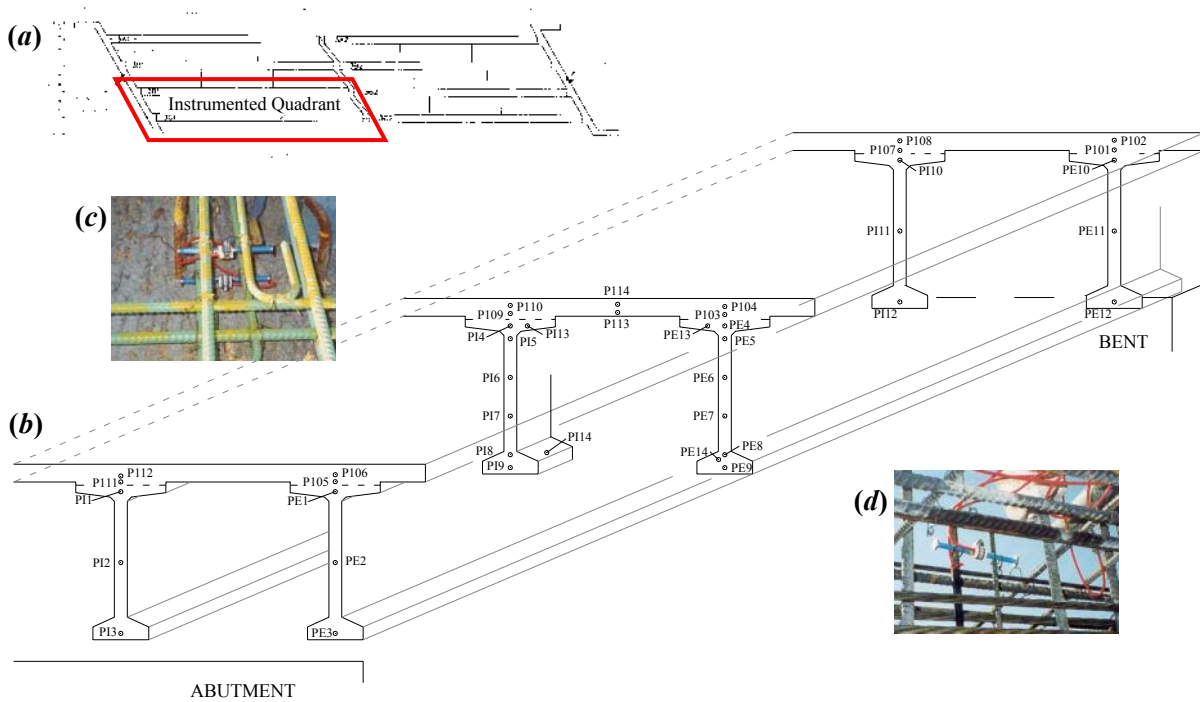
(a) Plan sketch of typical bridge showing instrumented quadrant; (b) locations of vibrating wire strain gages (with thermistors) within instrumented quadrant; typical installation in (c) deck, and (d) girder
